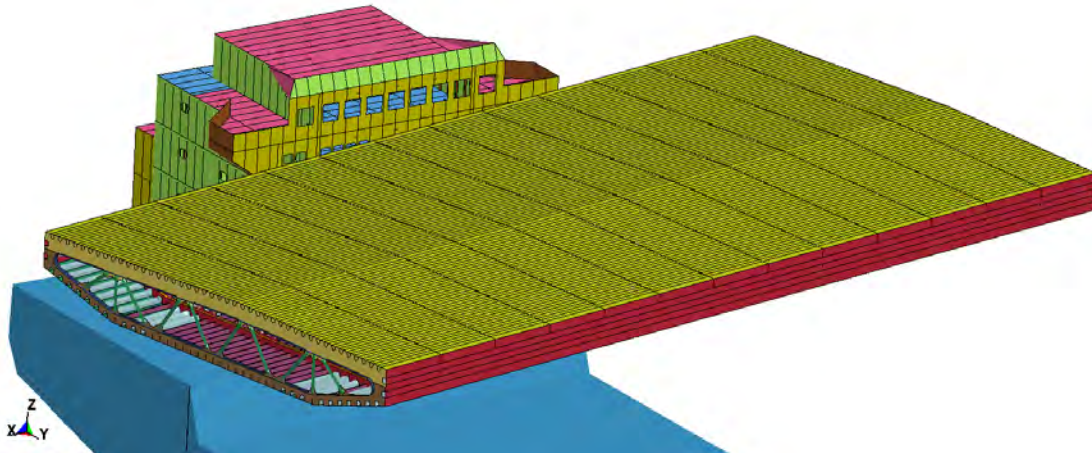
Deckhouse-bridge girder collision, 10 degree angle and high impact location
